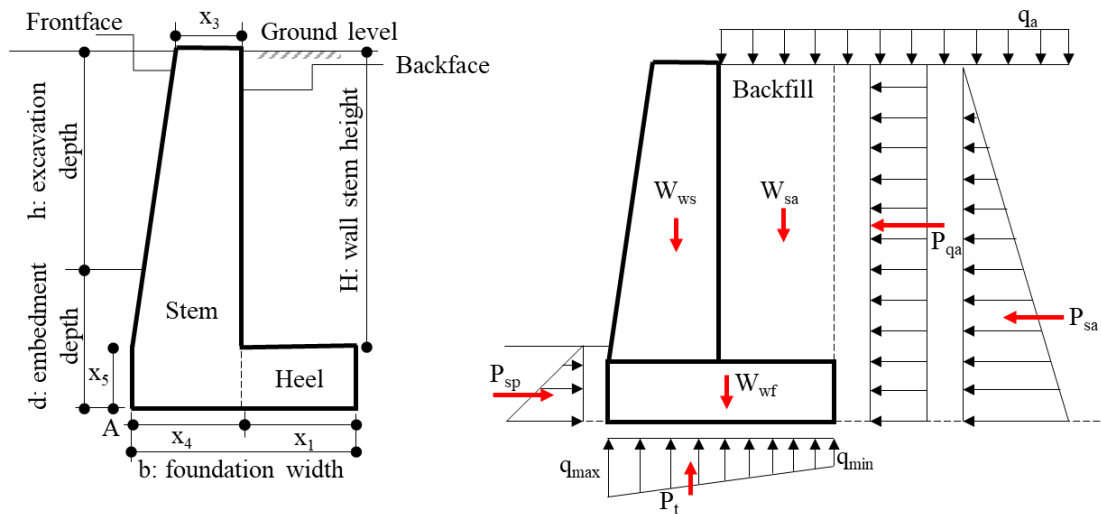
L-shaped retaining wall cross section and the load distribution mode of administration.
